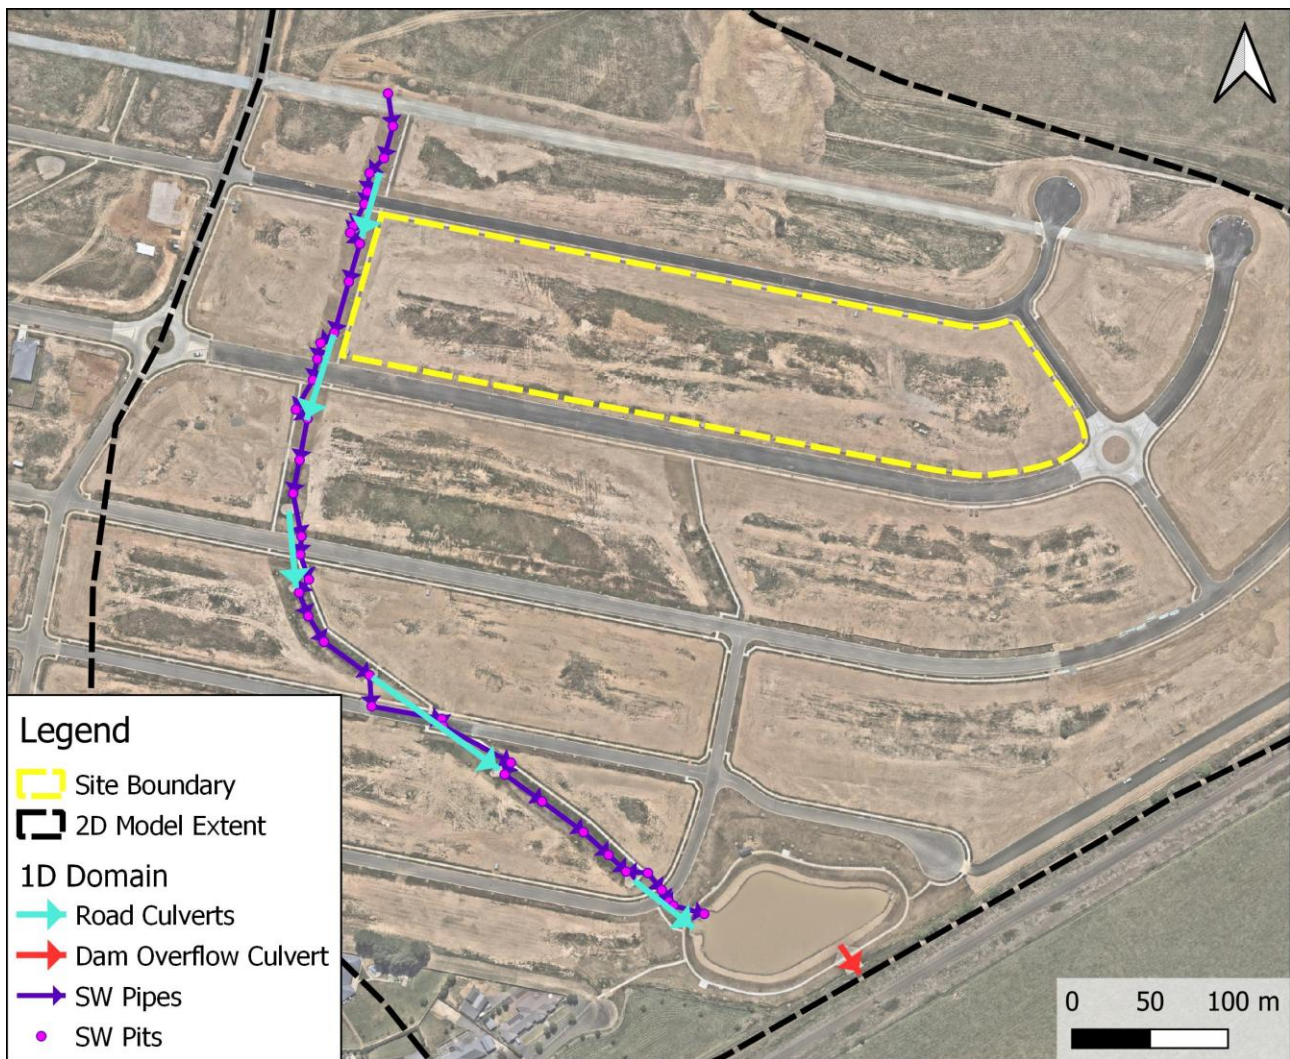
Stormwater pits and pipes incorporated into the hydraulic model
